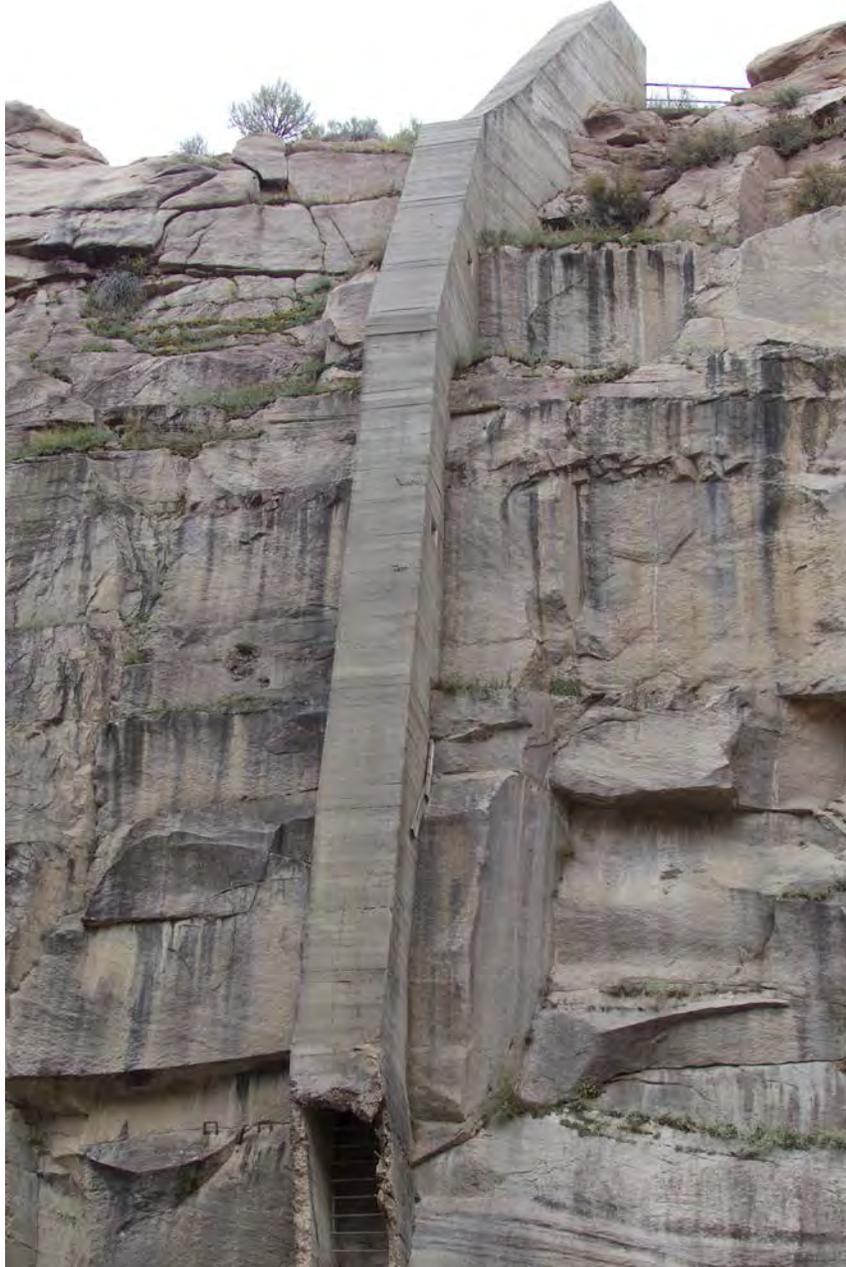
Abandoned concrete access ladderway (Feature G, contributing) from canyon floor. Note rebar used as ladder rungs. Camera facing south.
